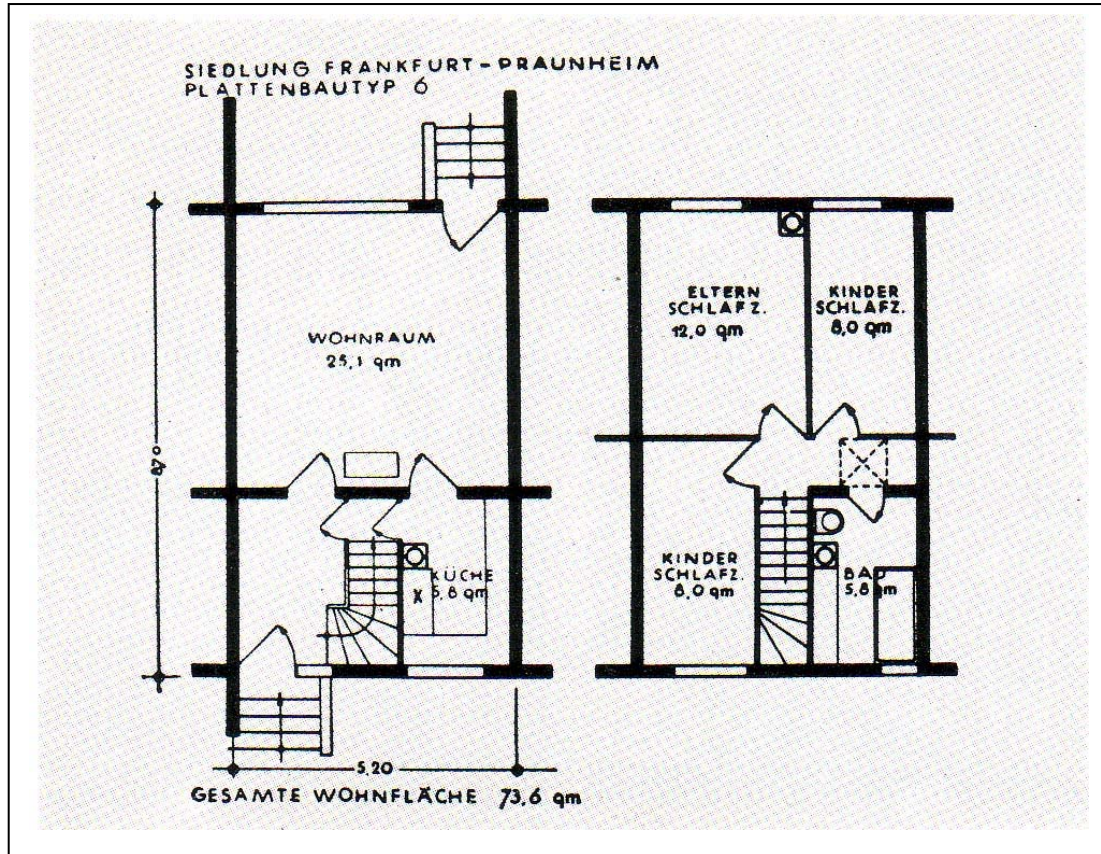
An example of the ground plan of a prefabricated apartment of the New Frankfurt Housing Scheme, Frankfurt, 1927
